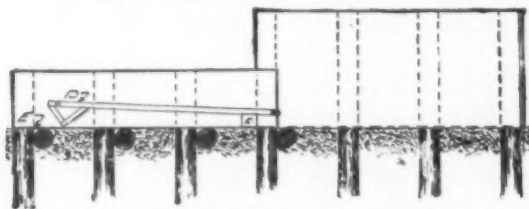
SIDE ELEVATION OF BARRICADE SHOWN IN FIGS. 24 AND 25.
